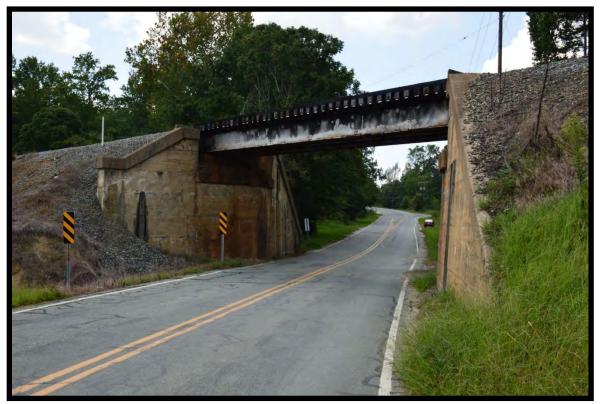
Overpass Carrying the North Carolina Railroad (GF8976) over Old Burlington Road, Looking West.
